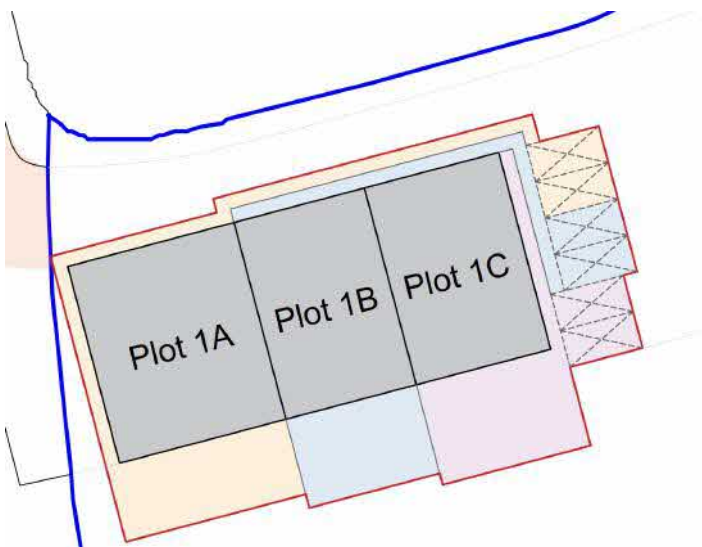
Proposed layout plan for Barn 1 (1A-1C)
